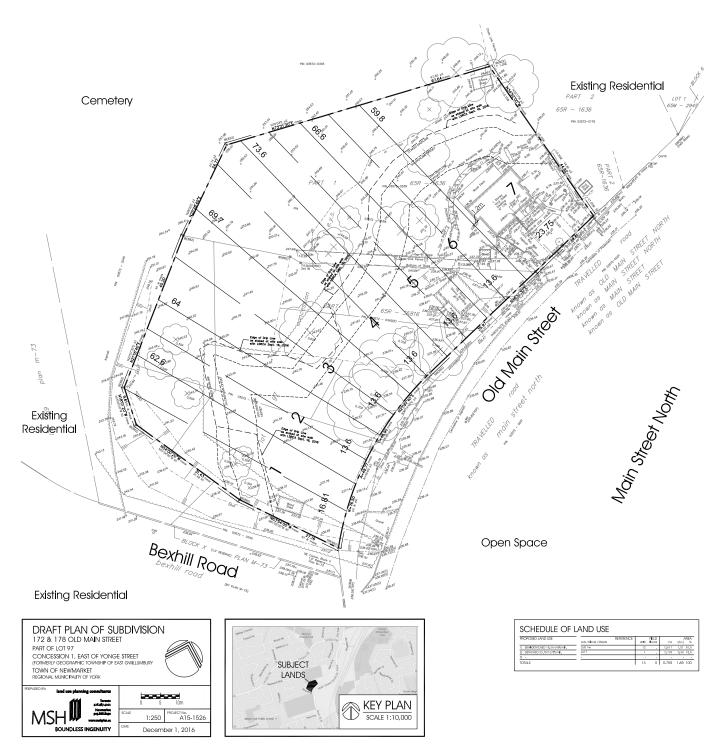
Draft Plan of Subdivision - 172-178 Old Main Street December 1, 2016
